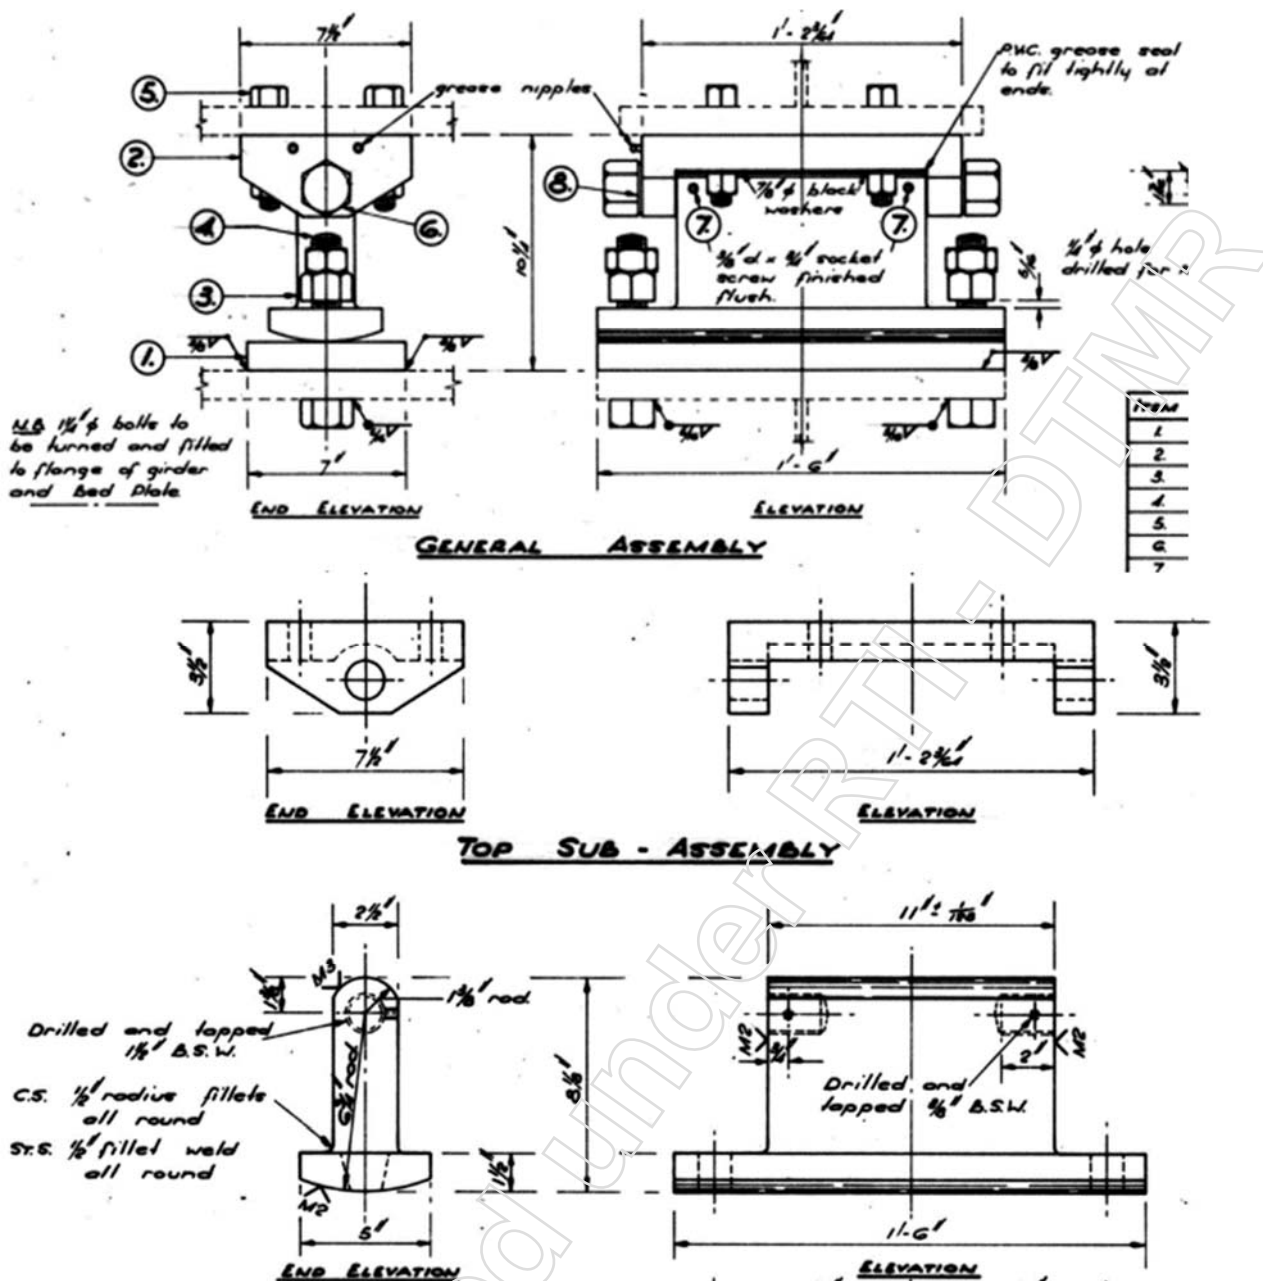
Expansion joint rocker bearings at drop-in spans. Note: Bottom radius of rocker ($6\frac{3}{4}$ "") rotates on a flat surface. Top radius of rocker ($1\frac{3}{8}$ "") rotates in a greased cylindrical groove in the sole plate. Grease nipples and PVC seals / washers provided to lubricate movement of rocker against sole plate.
